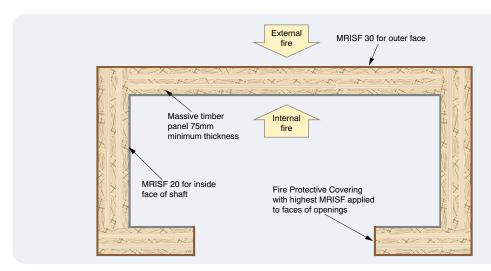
MRISF requirements for typical stair and lift shaft construction for single skin massive timber panel construction.
